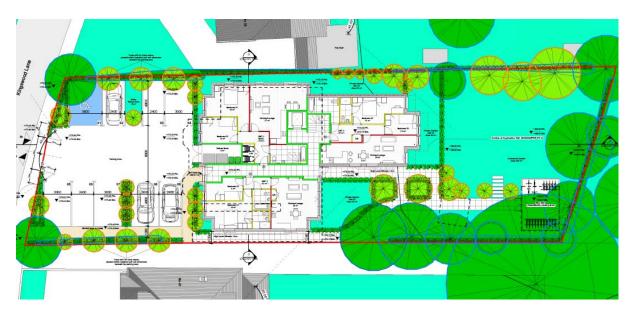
Proposed site plan showing proposal in relation to neighbouring properties
